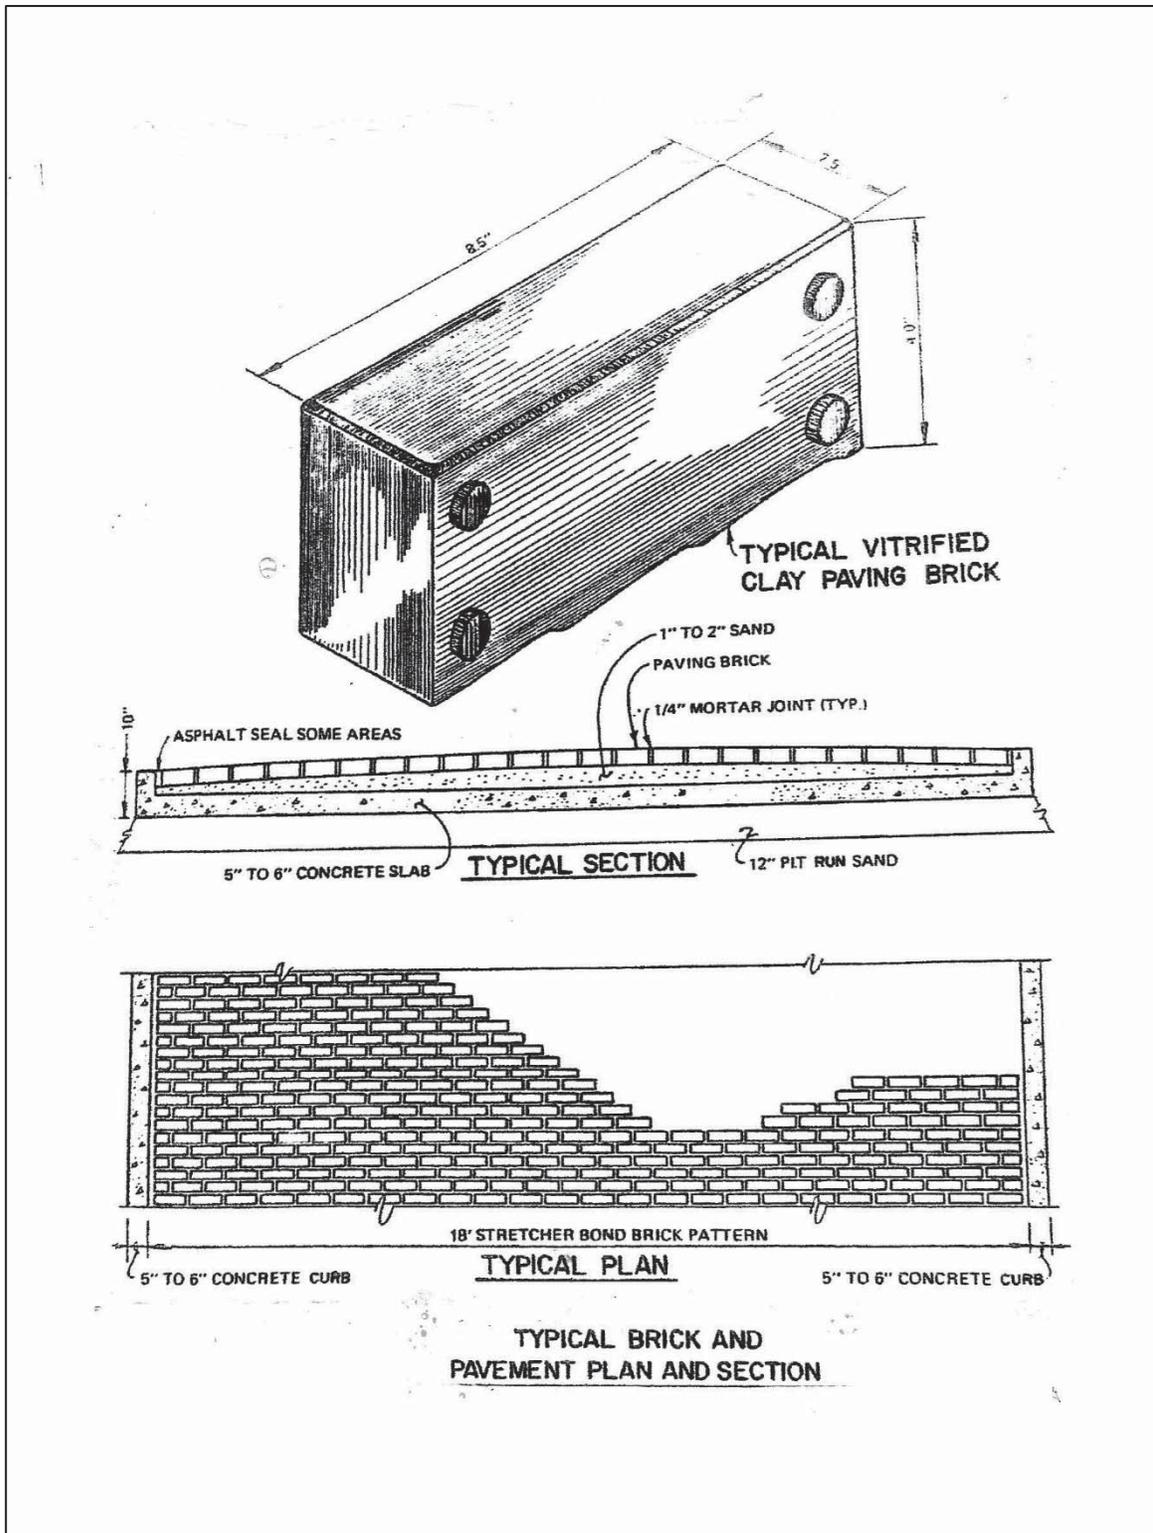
Diagram of typical plan and section of brick road (KCM 1986: Figure 4-1).
